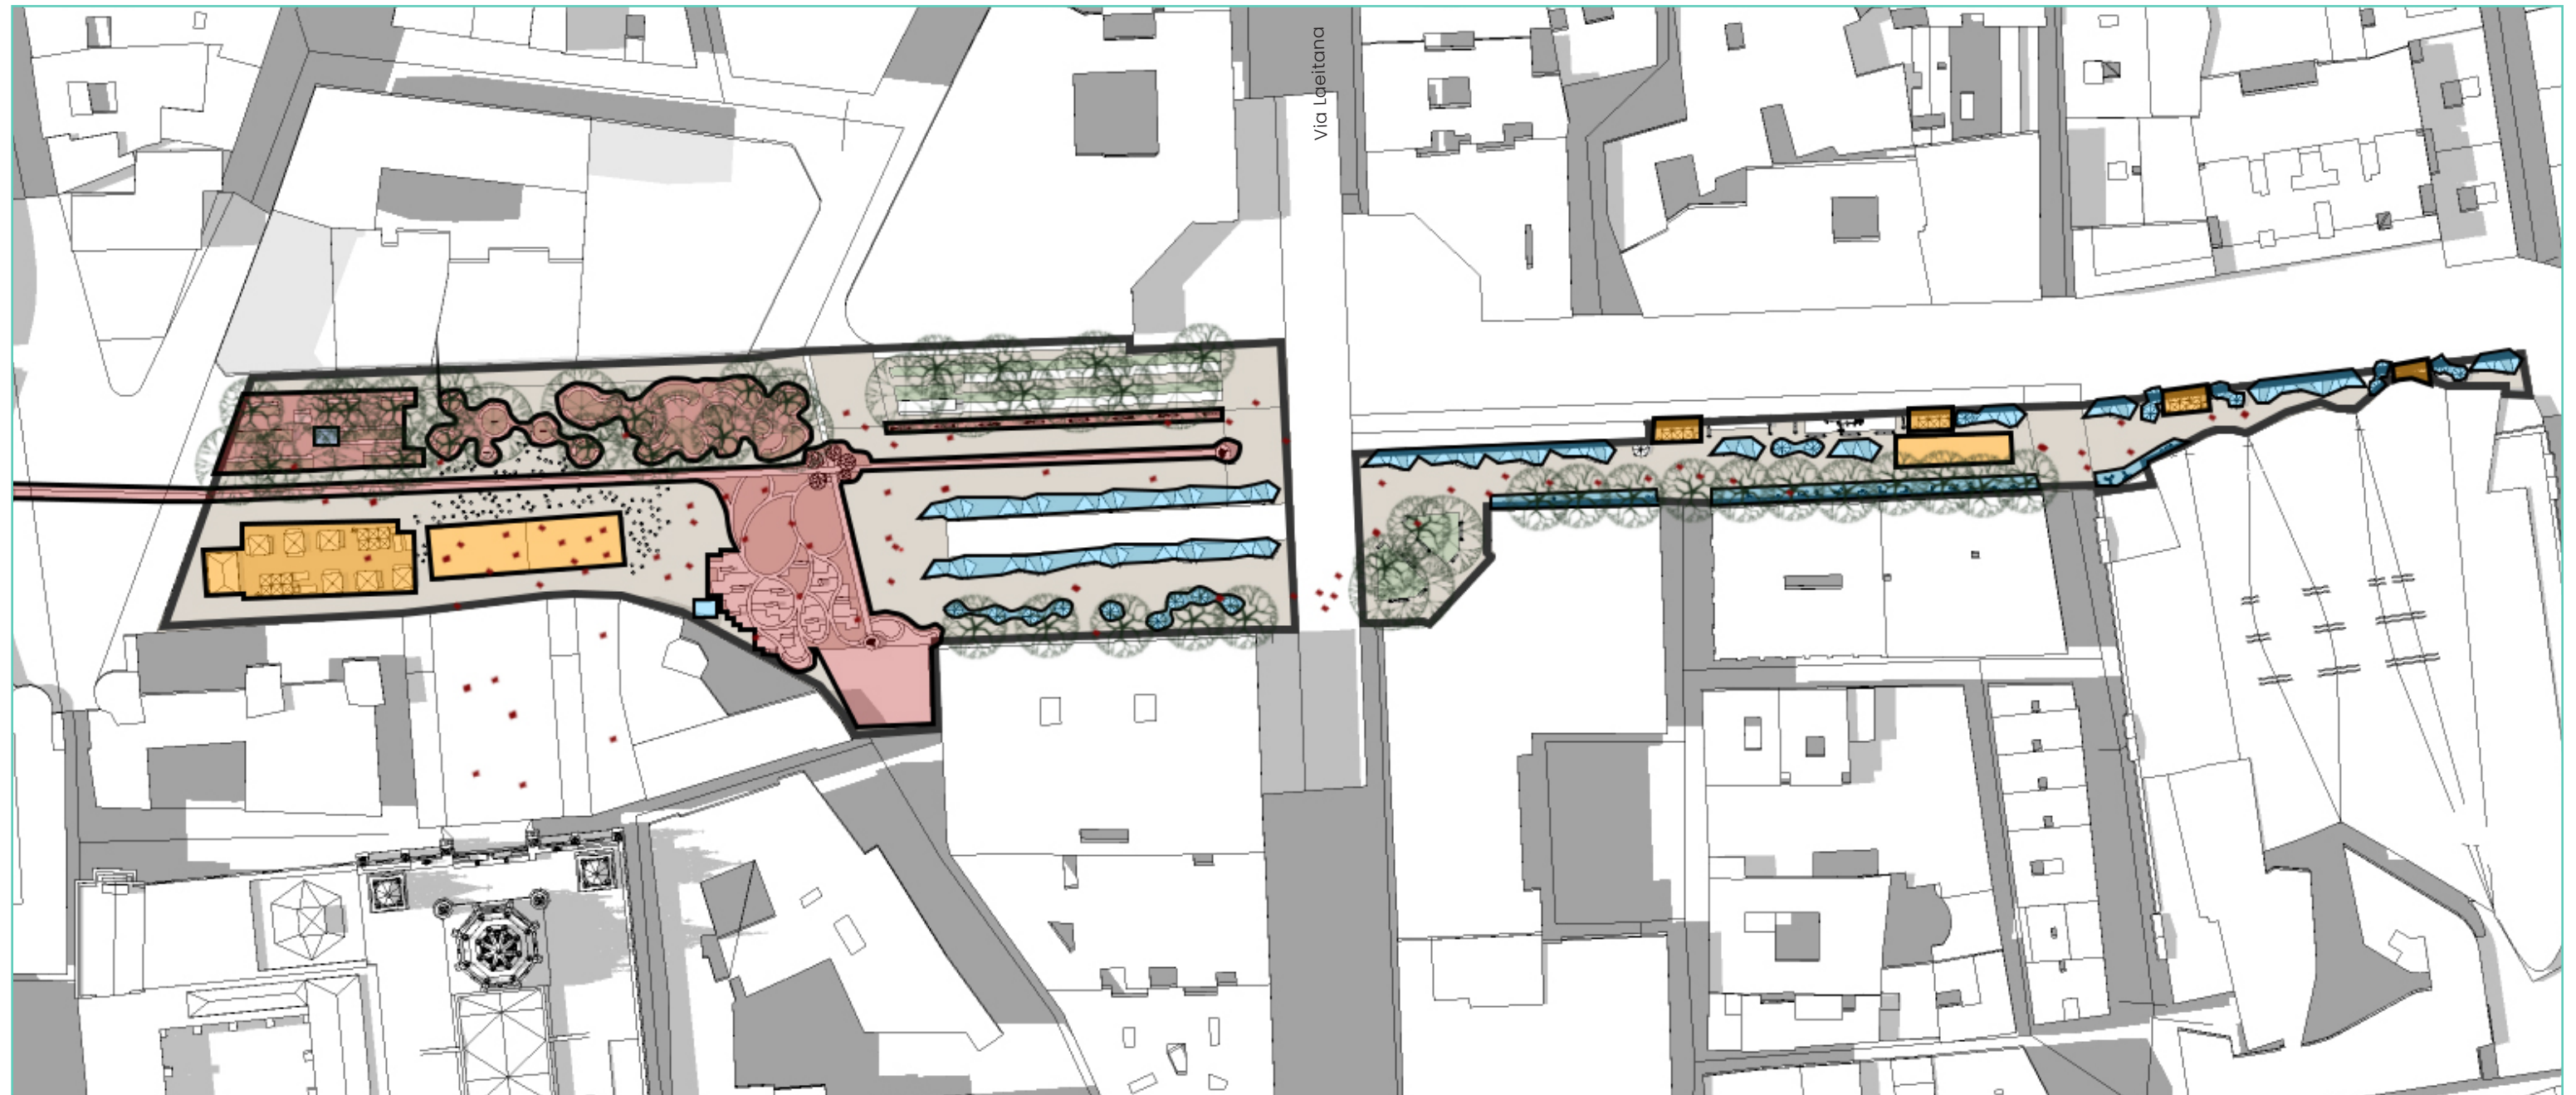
Site Plans for Plaça Nova on the left and Plaza Santa Caterina on the right
